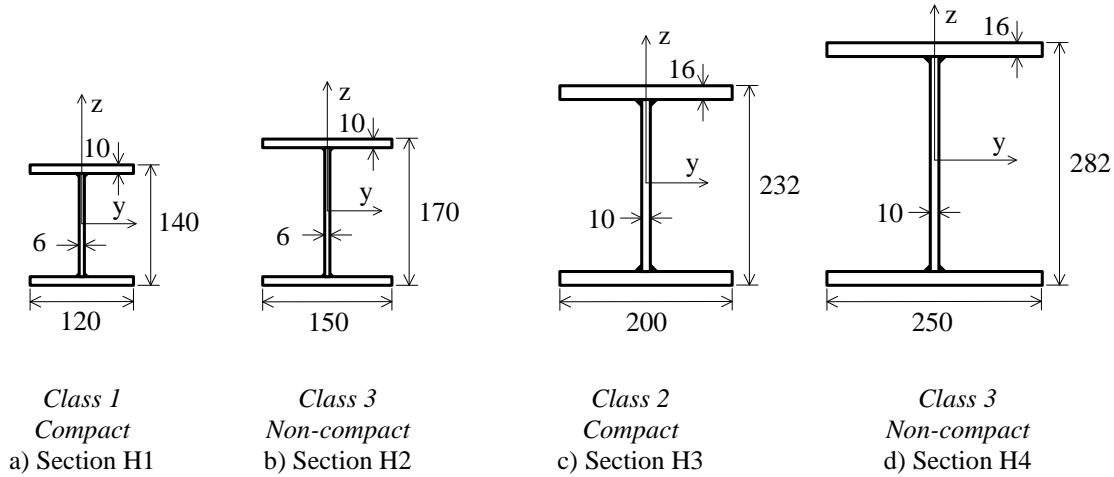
Normal cross-sectional dimensions of welded H-sections
